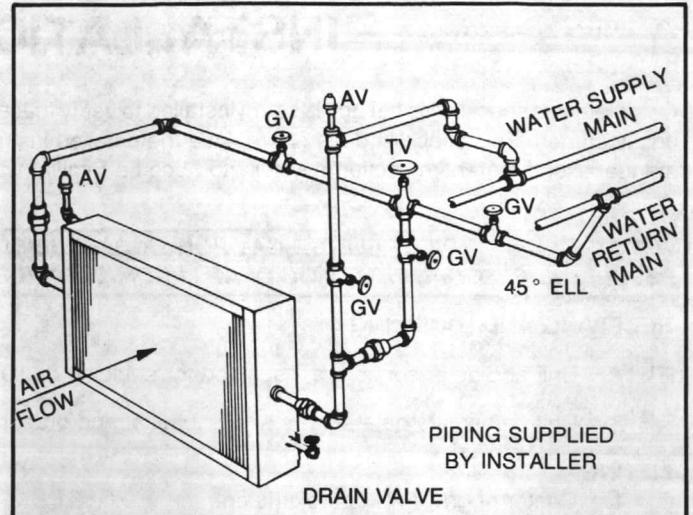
Typical Piping for Type W or WA, One-Row Water Coil
